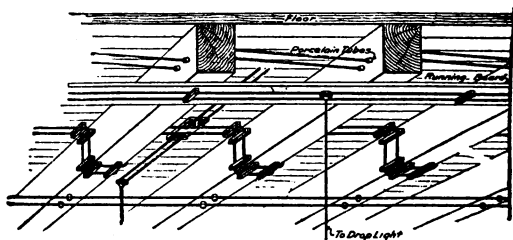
METHODS OF WIRING OVER CEILING TIMBERS
